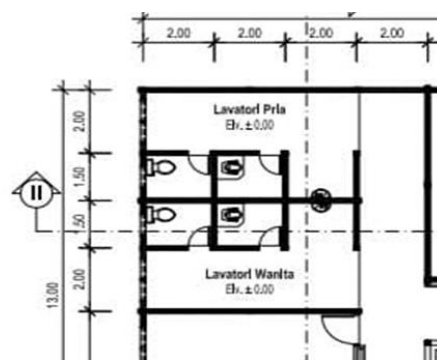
Toilet Floorplan of Mutiara Bangsa Kendal Special School
